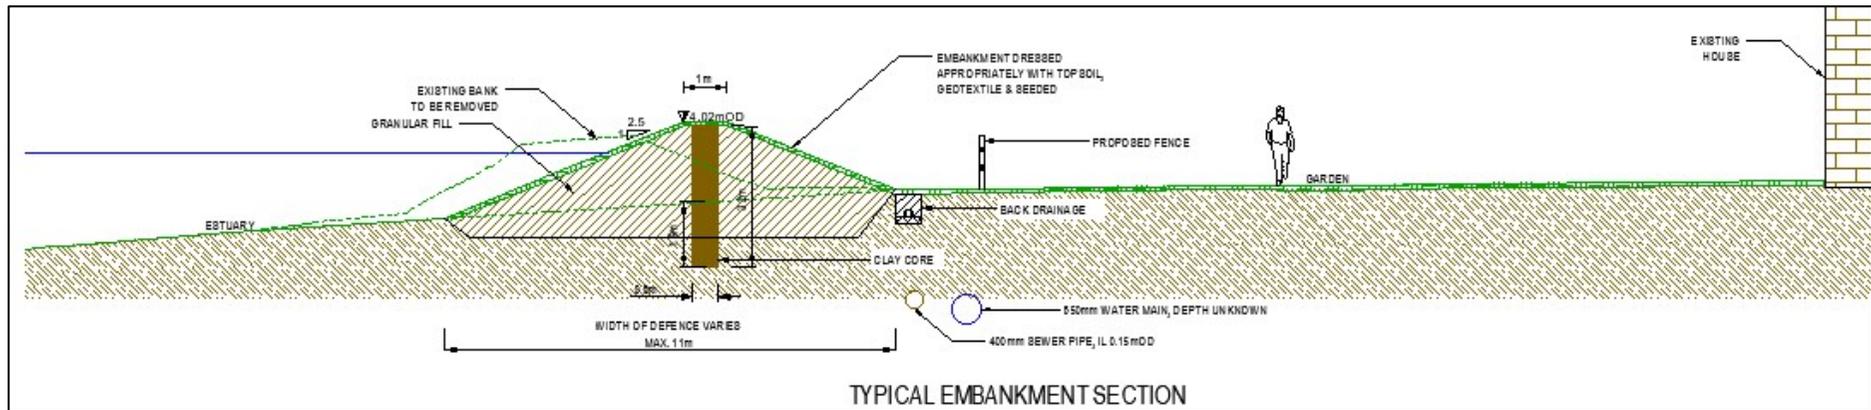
Cross-section of a typical embankment at Marsh Lane and Burrow Road
